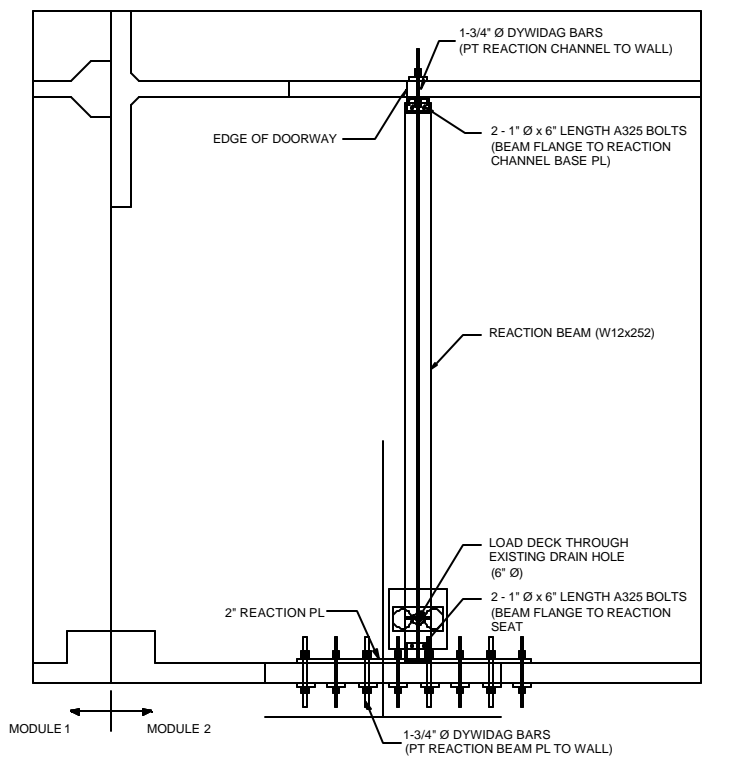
Setup for Deck Test - Plan View at Service Deck Level
